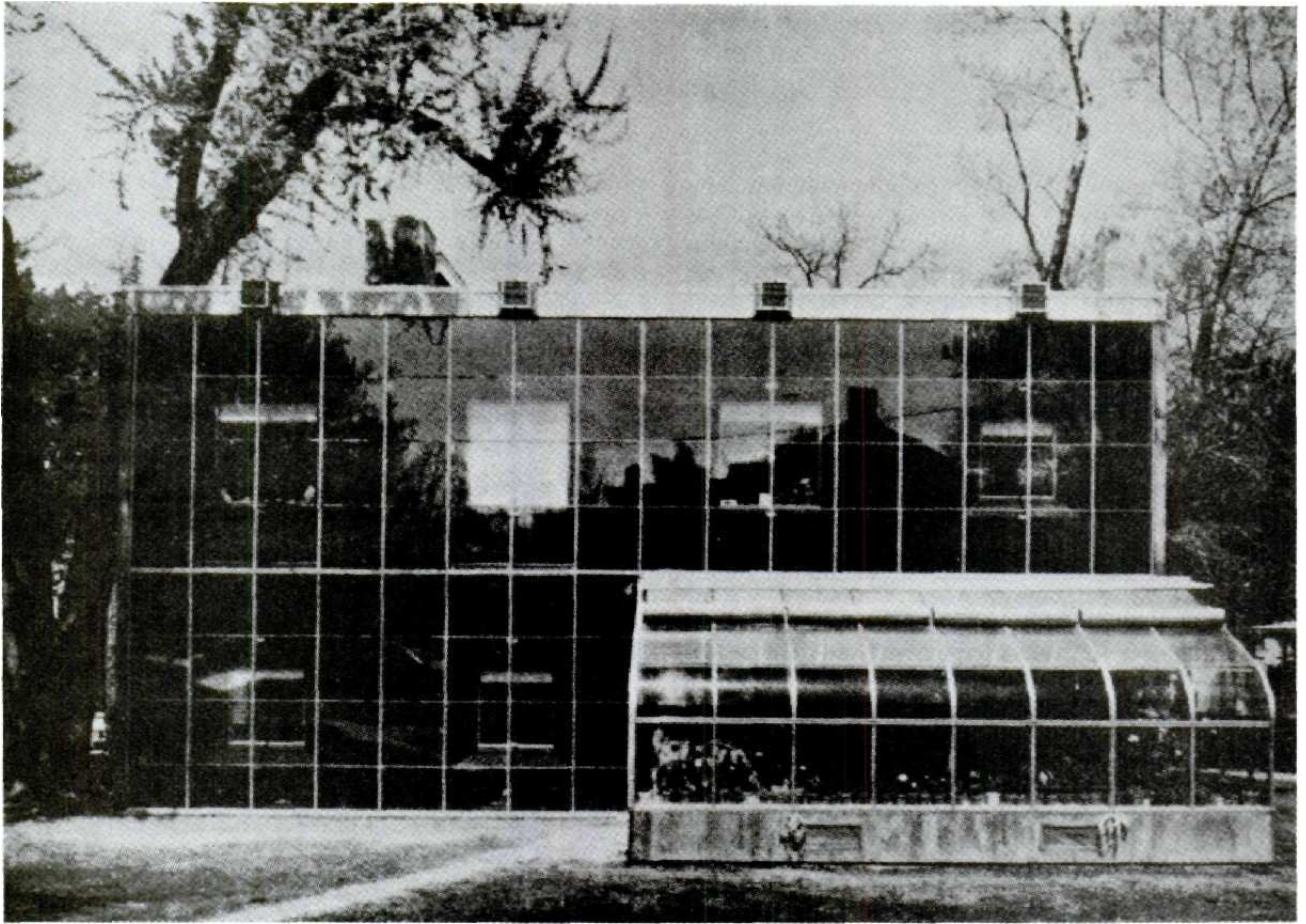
Doug Kelbaugh's house - south elevation (KEL-1)
